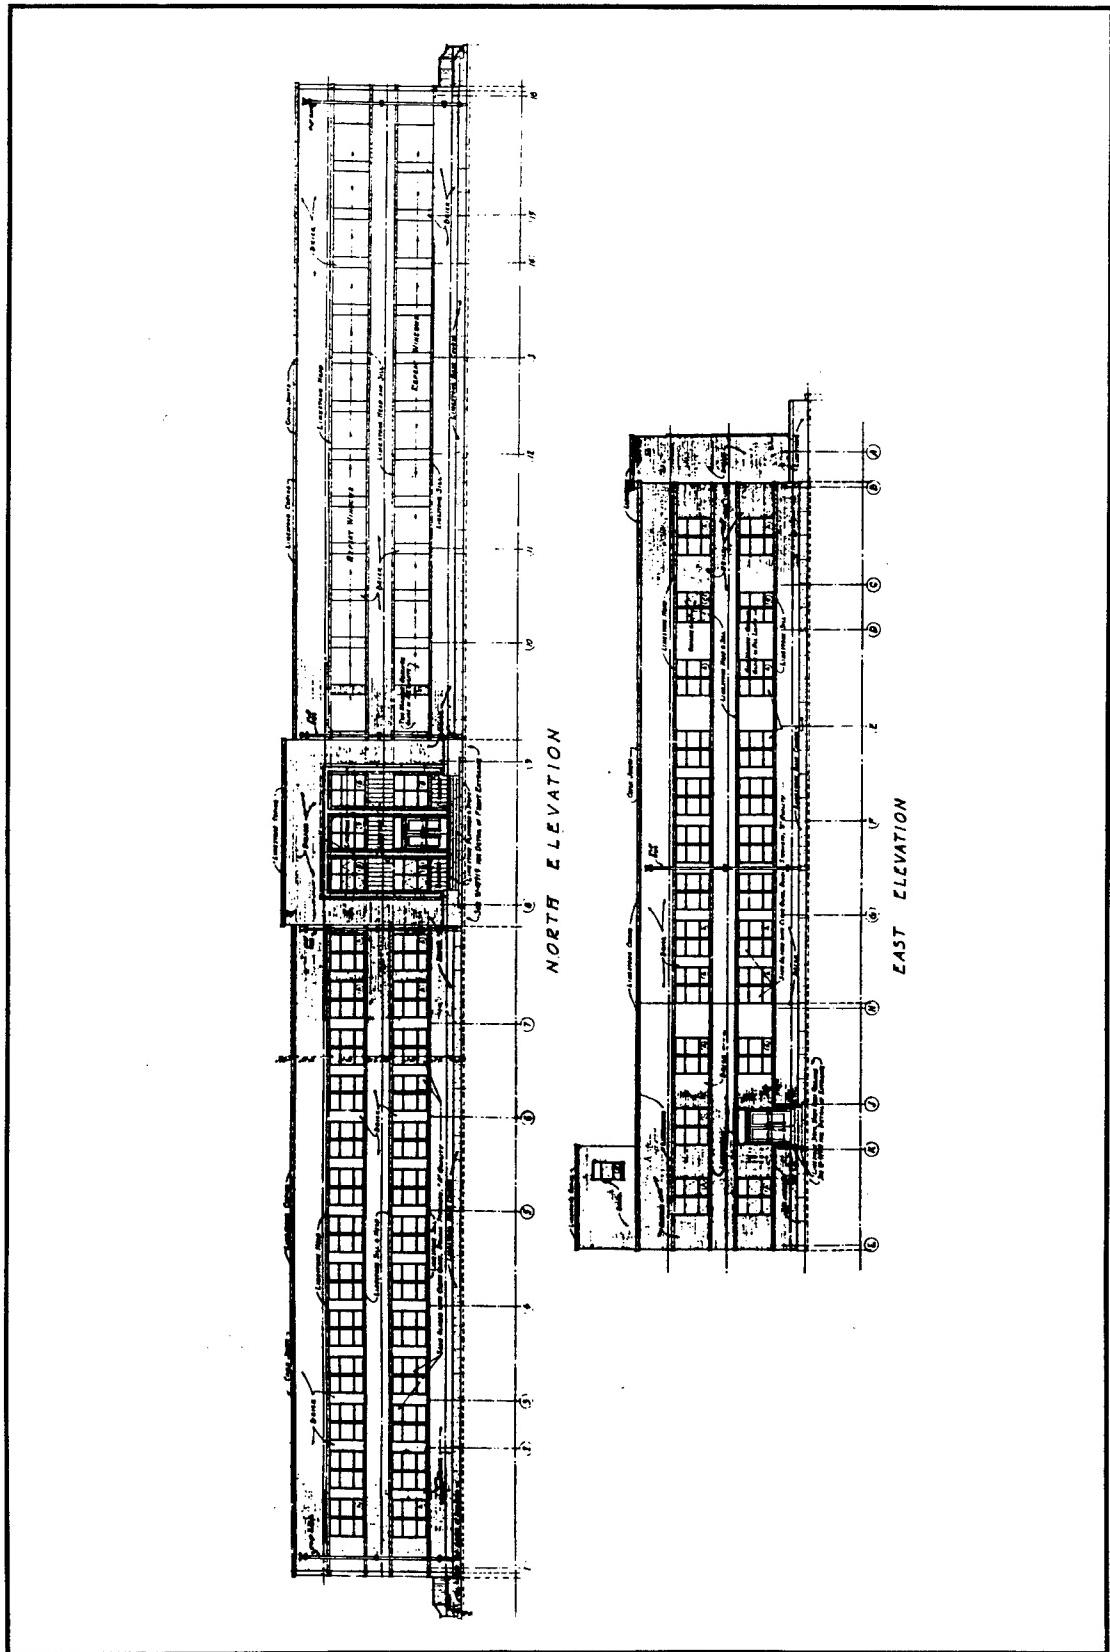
Elevations, Administration Building (Building 703), Indiana Ordnance Works Plant 1 (INAAP Drawing W-45916).
